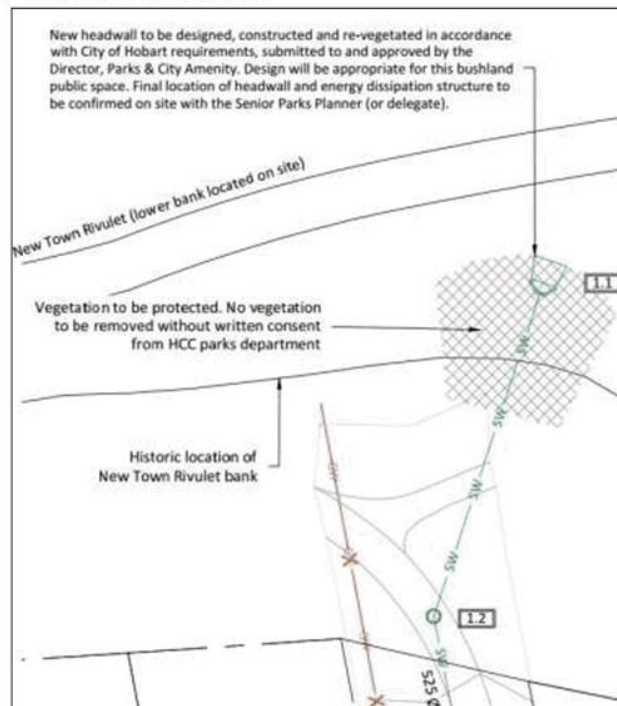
Engineers site plan of proposed location and design details of storm water outlet including remedial works on the southern streambank of New Town Rivulet.
